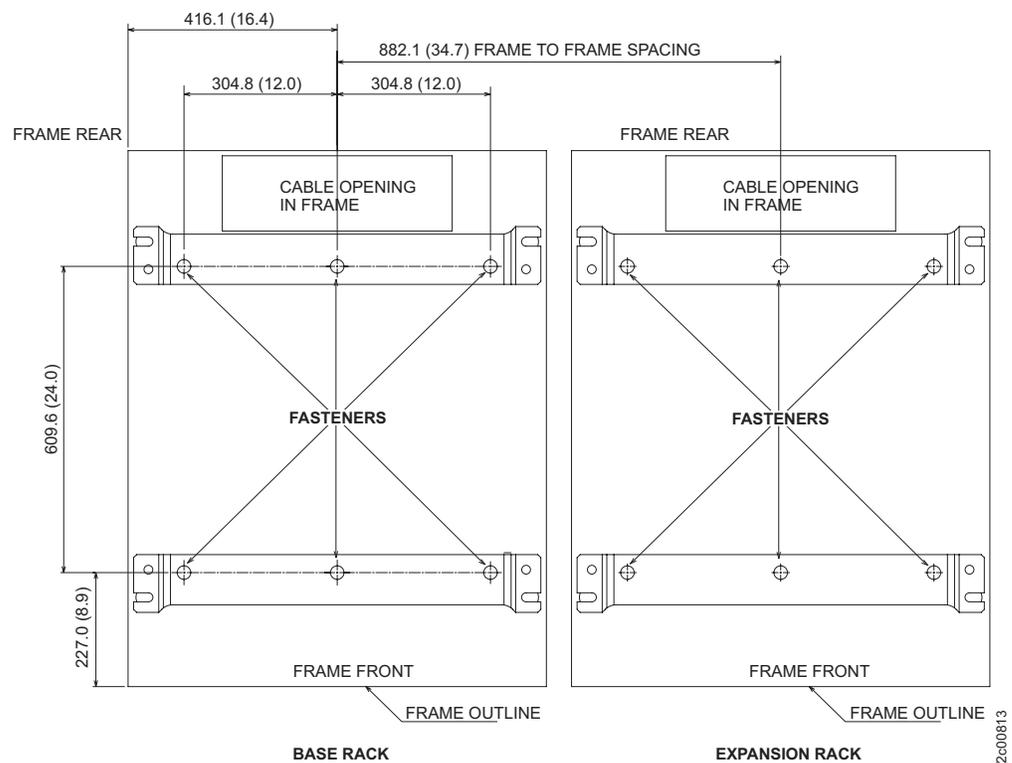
Locations for fastener installation (nonraised floor). Dimensions are in millimeters (inches).
